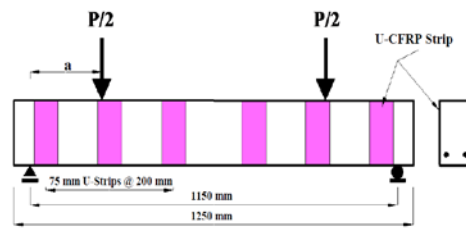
Shear Strengthening without End Anchoring B6 and B8
